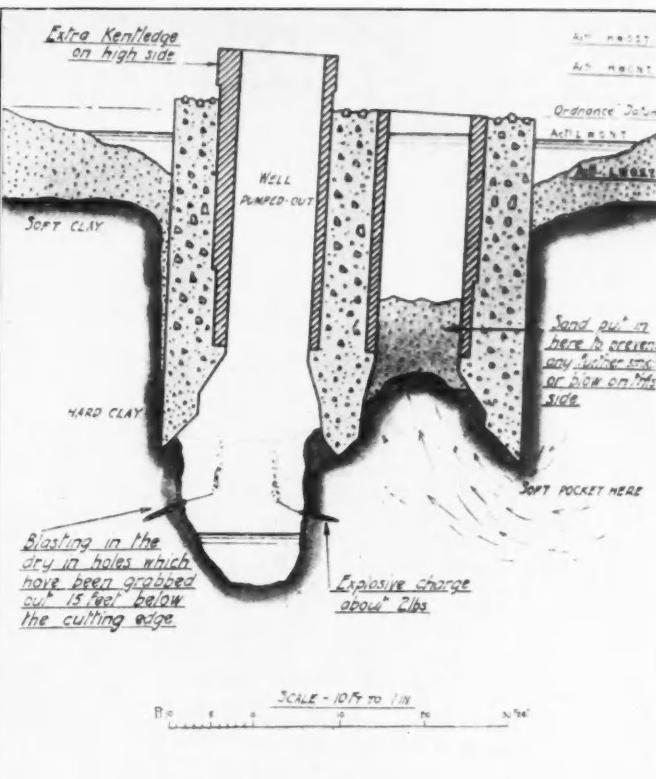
Sectional elevation of monolith excavated dry showing at right a blow of water-bearing sand.
